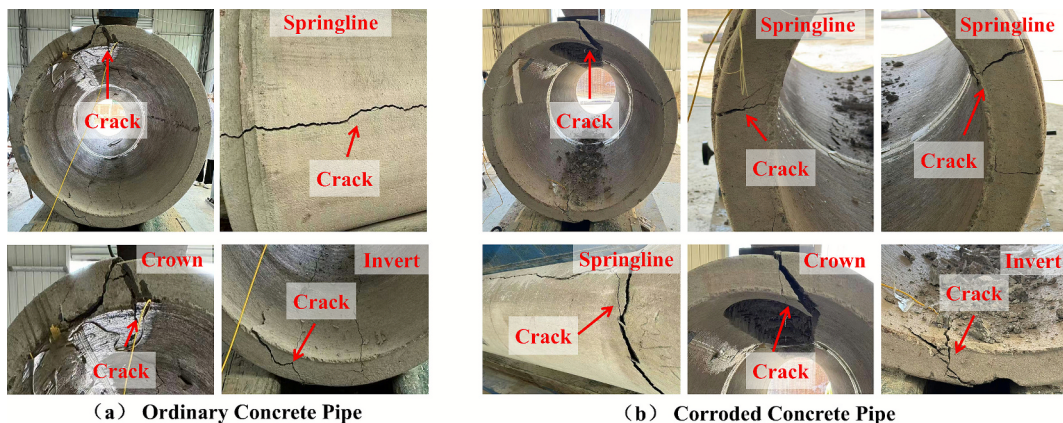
Failure Modes of the Concrete Pipe Specimen: (a) Ordinary Concrete Pipe, and (b) Corroded Concrete Pipe.
